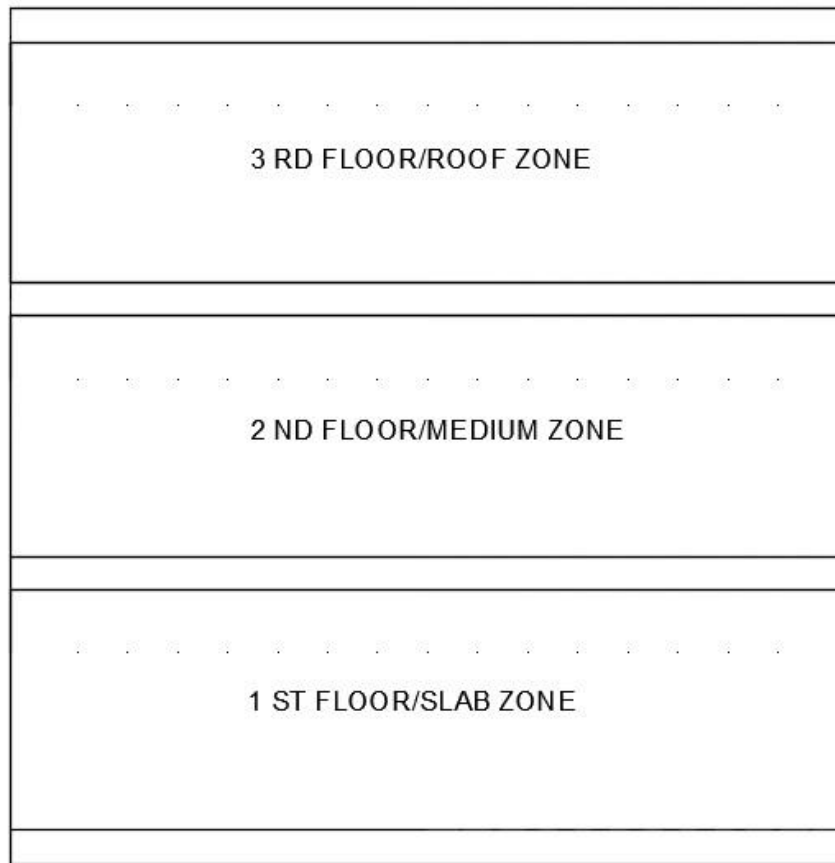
Building zone orientations (vertical cross section, not-to-scale)
